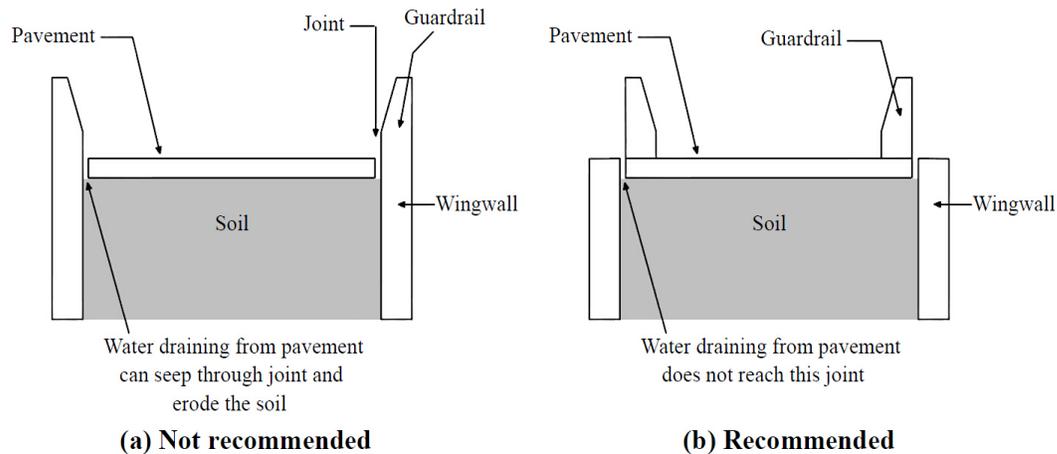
Approach slab joint details at pavement edge (Briaud et al., 1997)
